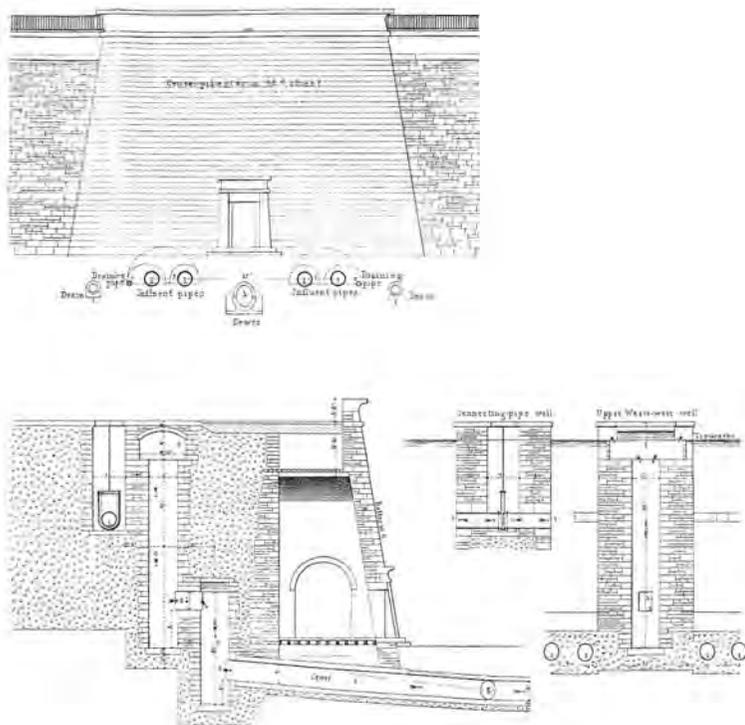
Murray Hill Distributing Reservoir. Elevation and cross section details at entry to pipe vaults.
